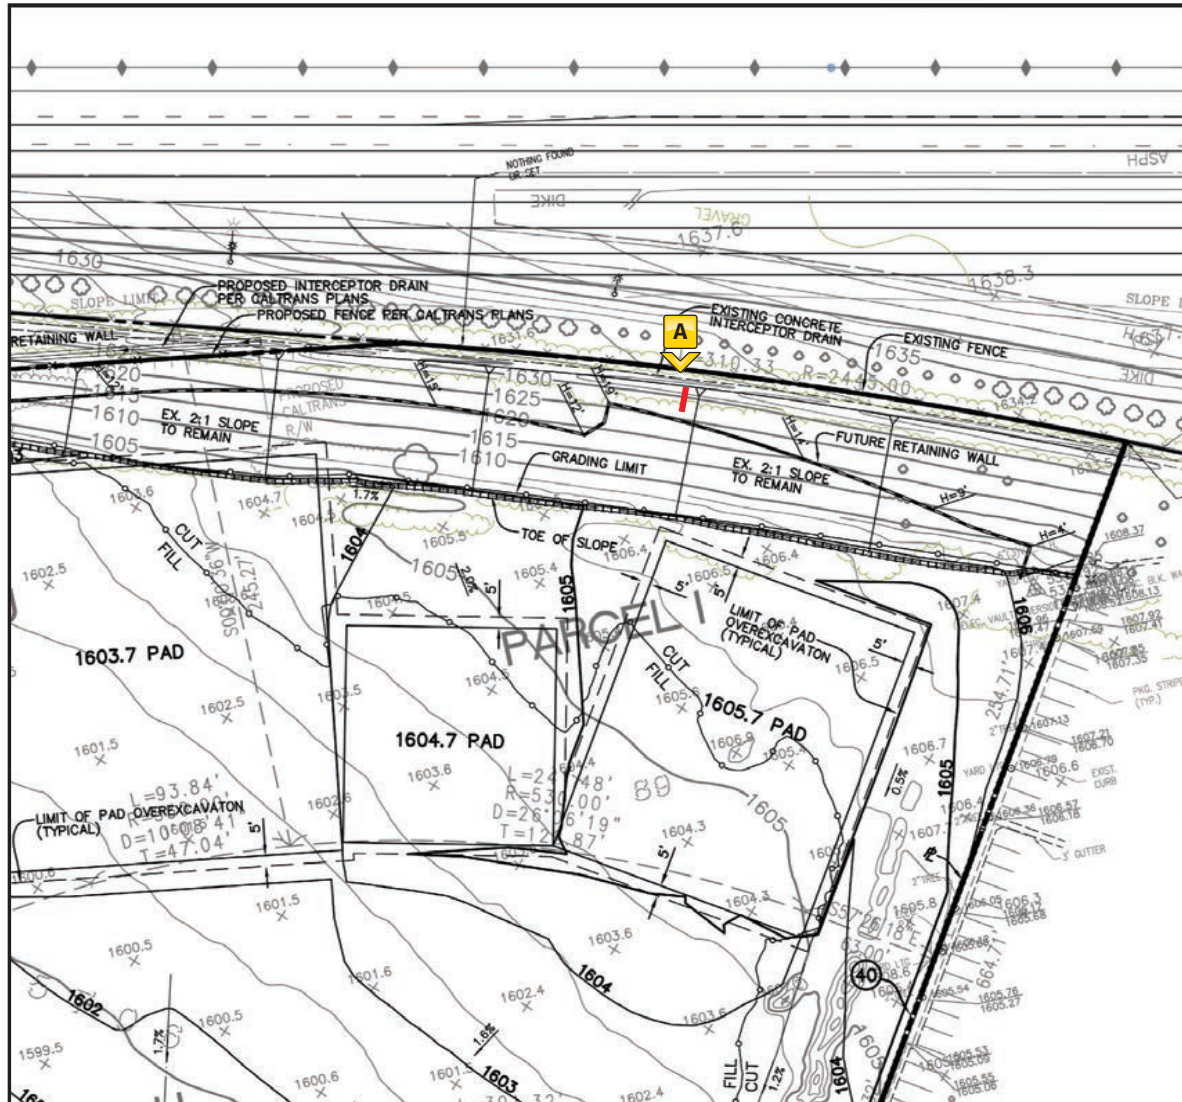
P15-0820 and P16-0219, Project Plans
